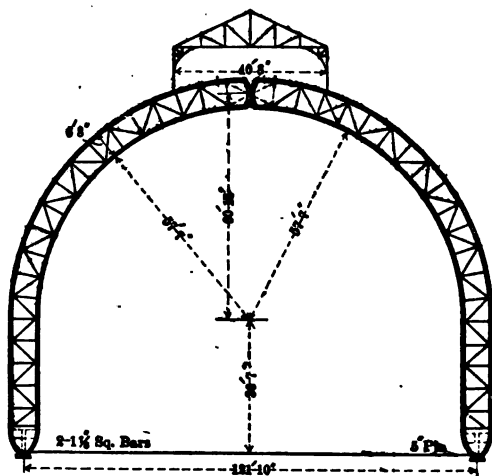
Three-hinged Arch, Machinery Hall, Chicago Exposition
